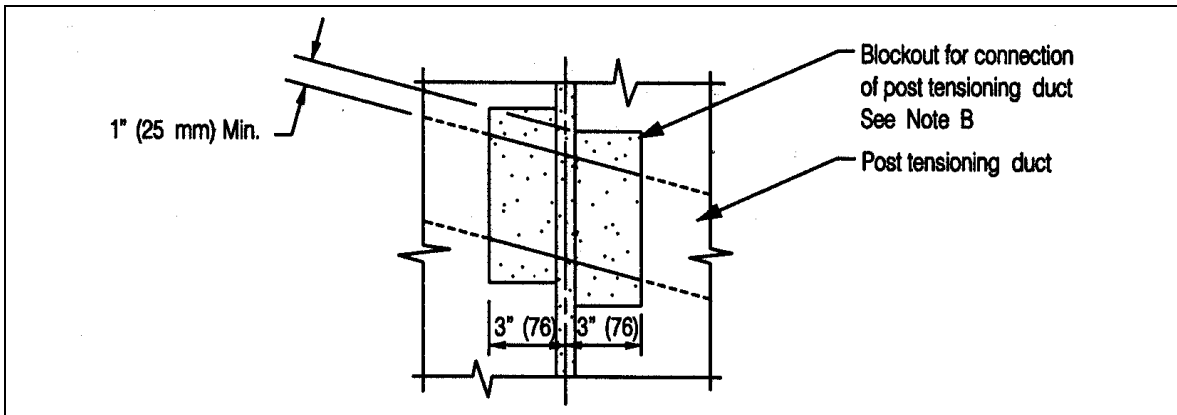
Block-out for post-tensioning duct splice plan (PCINER, 2002)
